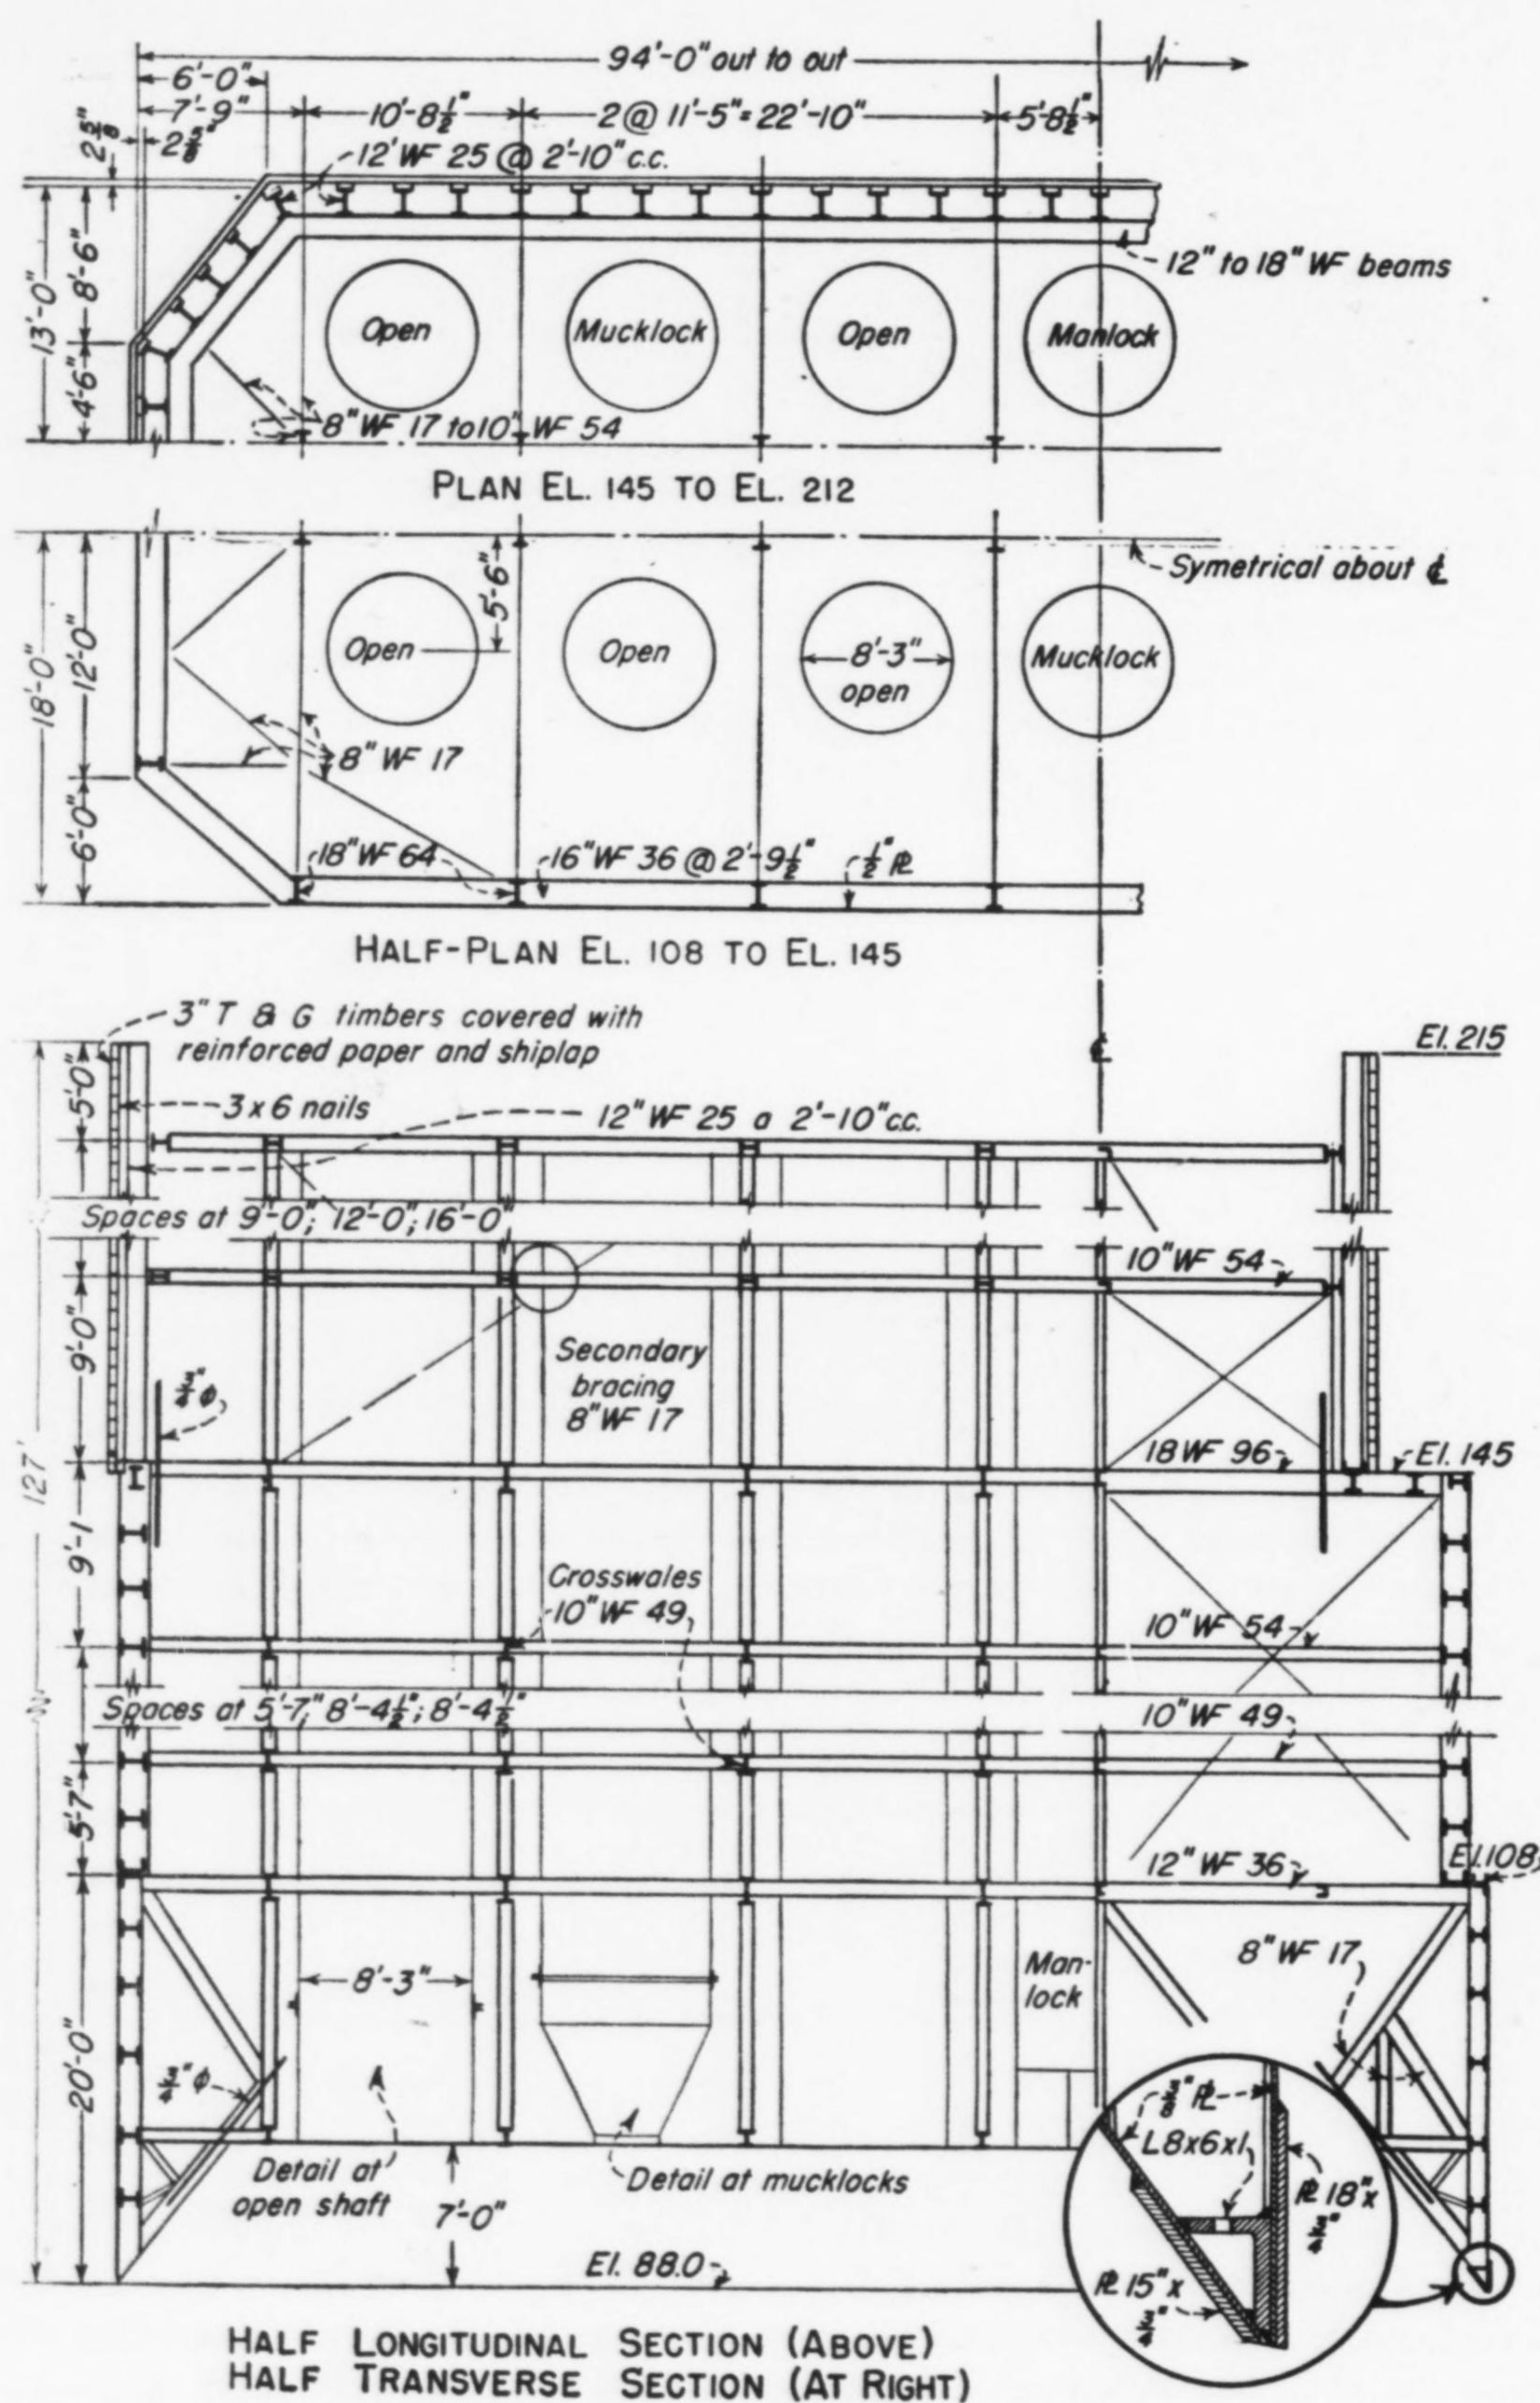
Cutting edge and caisson for Pier III. The cofferdam section above El. 173 was removed after the pier was completed to above its top.
